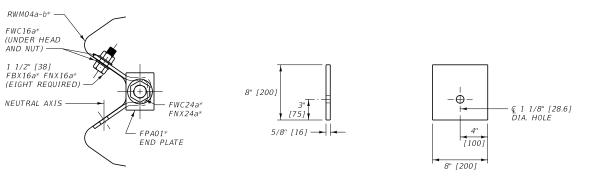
DETAILED DRAWING REFERENCE STANDARD SPEC. SECTION 606, 203
